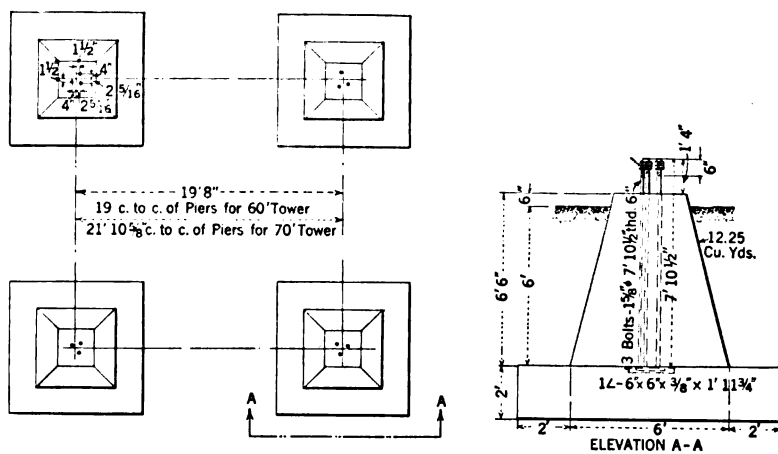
MASONRY PLAN AND ANCHOR BOLTS
